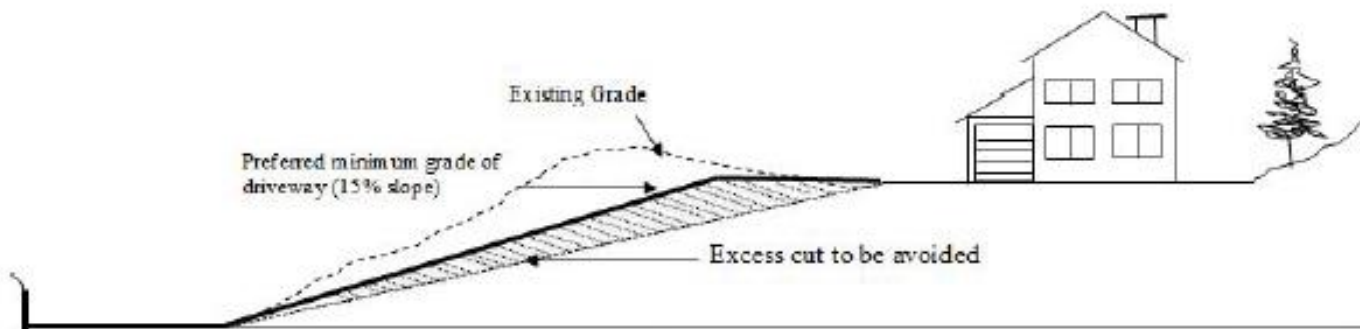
Conforms: When developing on steep slopes, design access roads and driveways that are closest to grade and meet minimum standards for fire safety.
